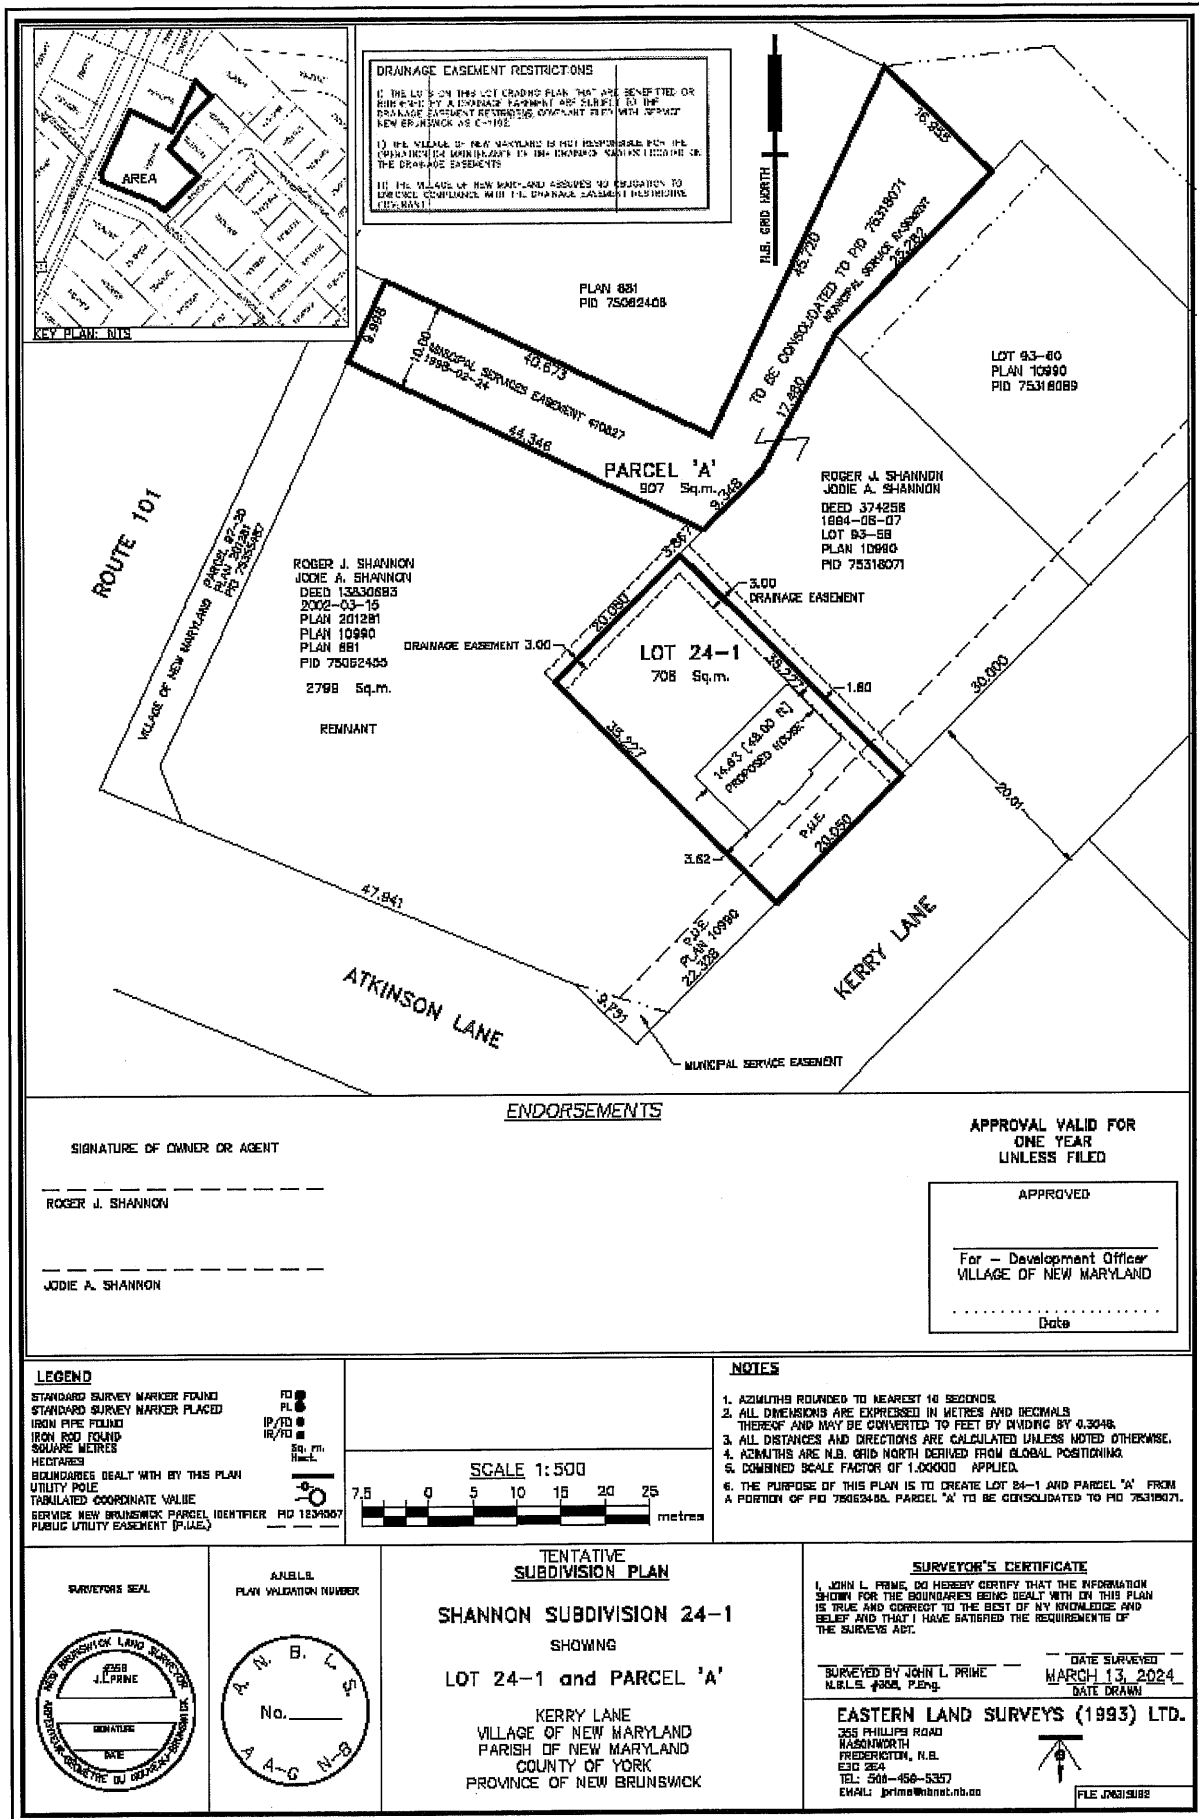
Tentative Subdivision Plan - Shannon Subdivision 24-1
